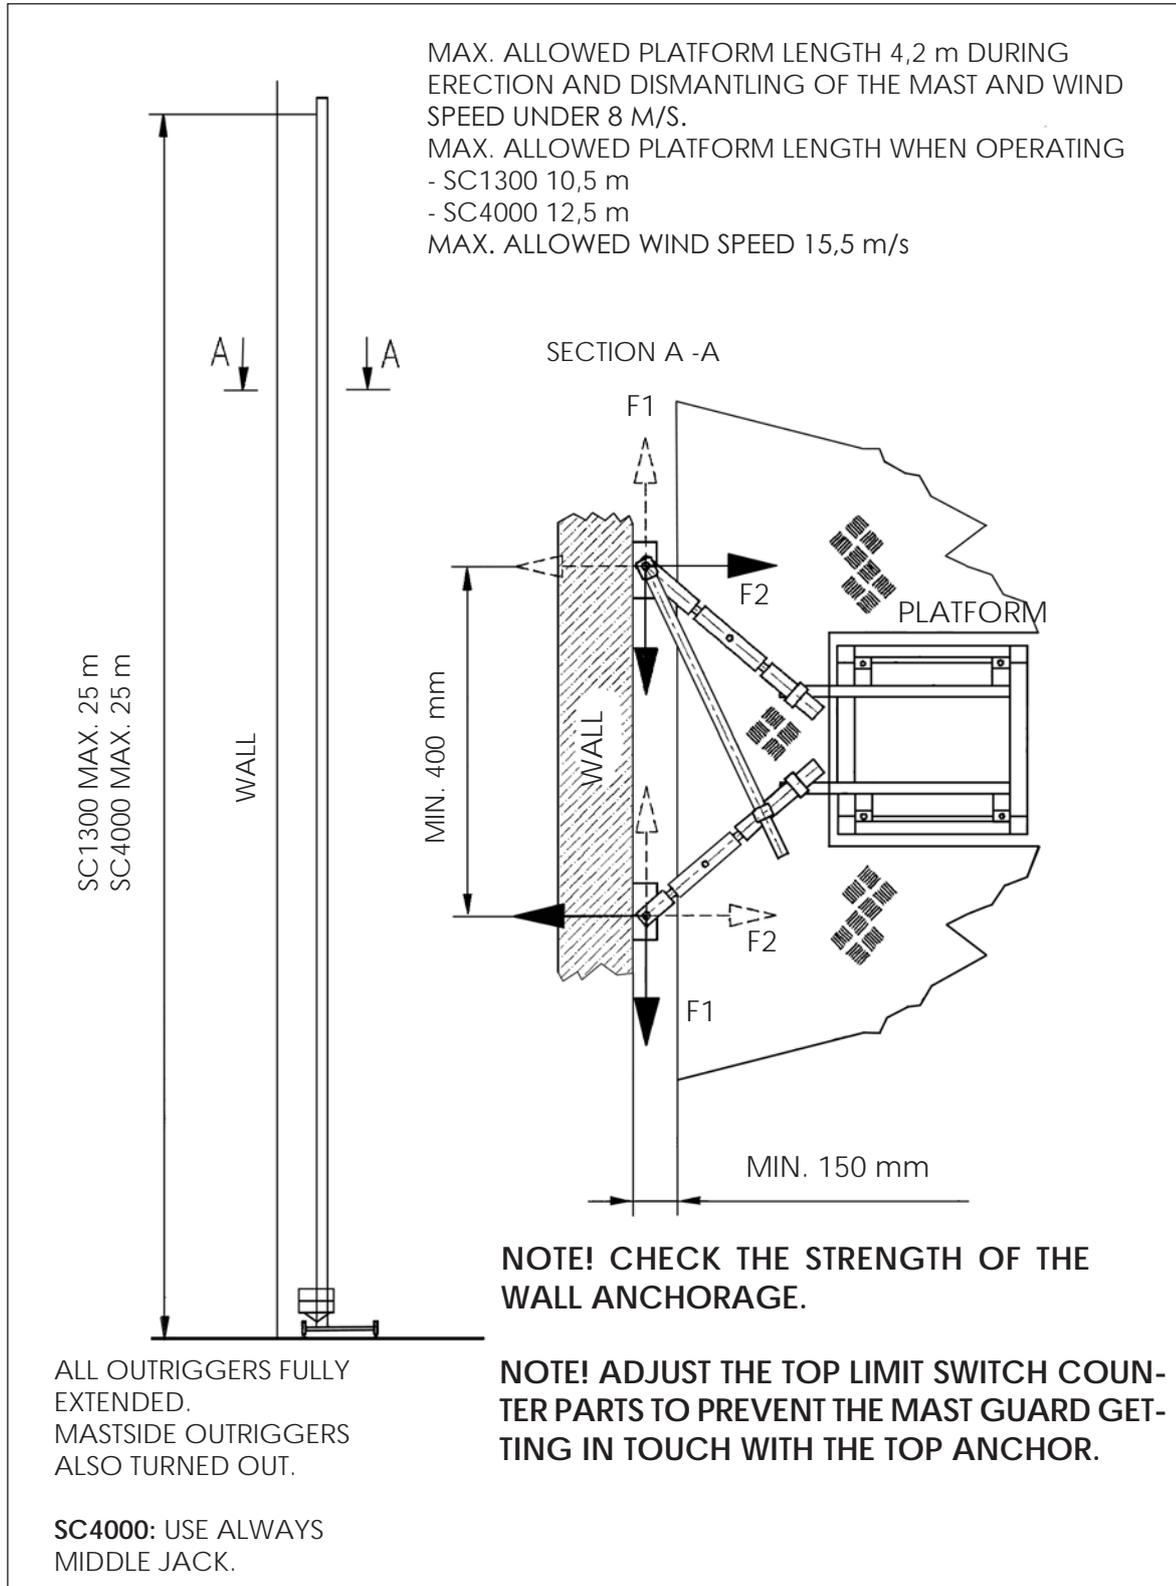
Wall anchorage instructions for wheel chassis.
